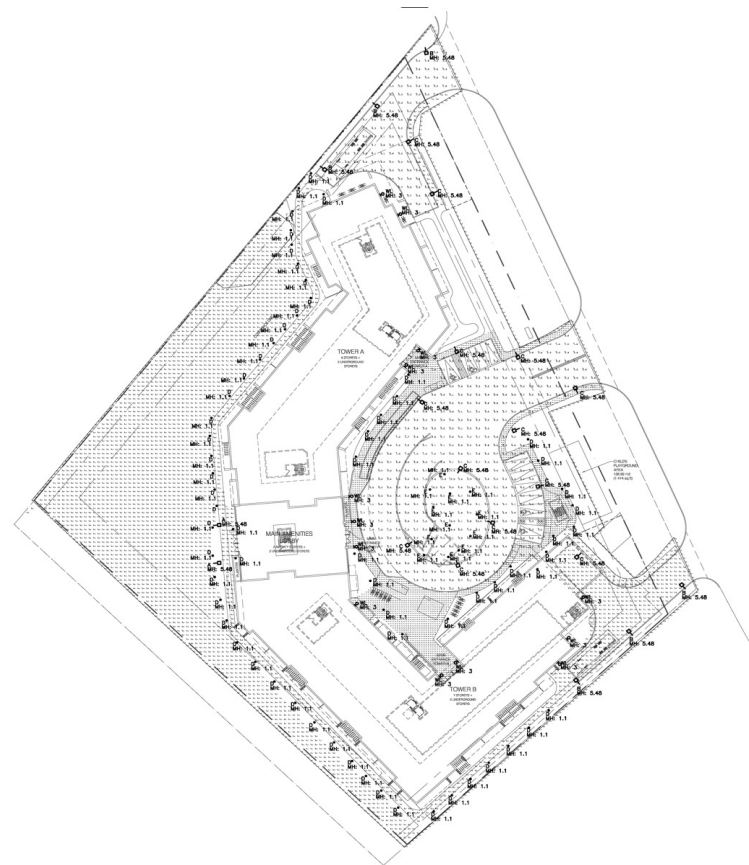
LIGHTING PHOTOMETRIC PLAN
